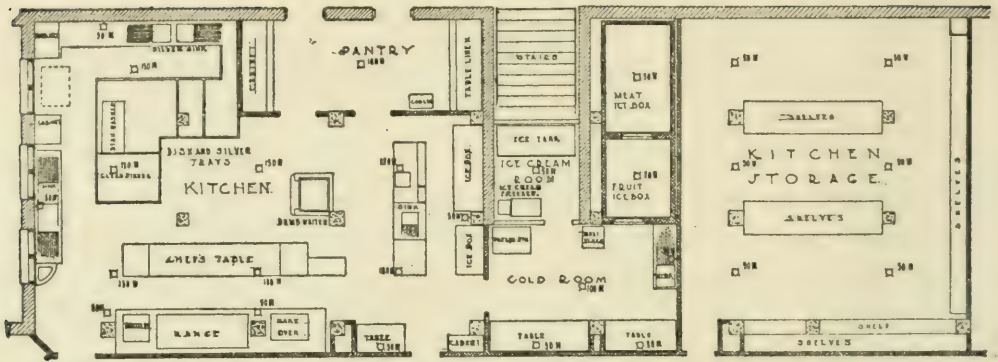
A floor plan of typical kitchen for club dining room showing various departments and proper location for lighting units.
